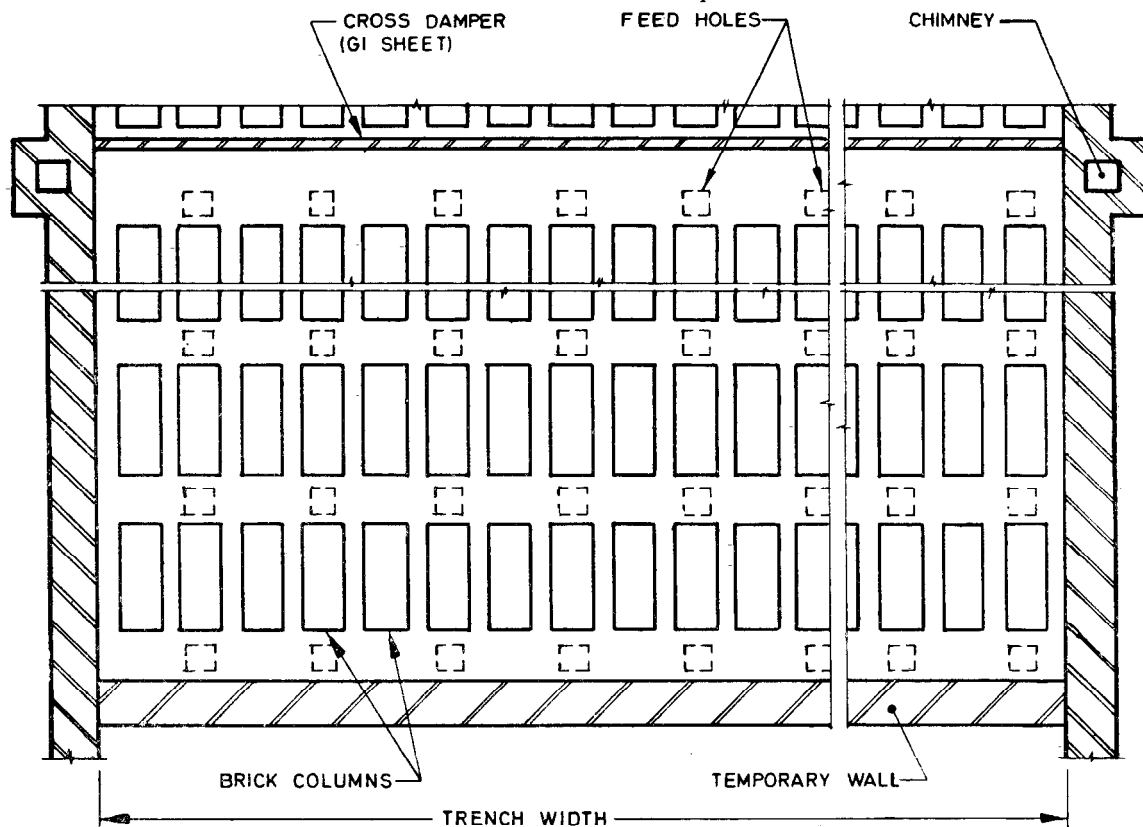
PLAN SHOWING DETAILS OF FEED HOLES AND TEMPORARY WALL FOR INITIATING FIRE.
